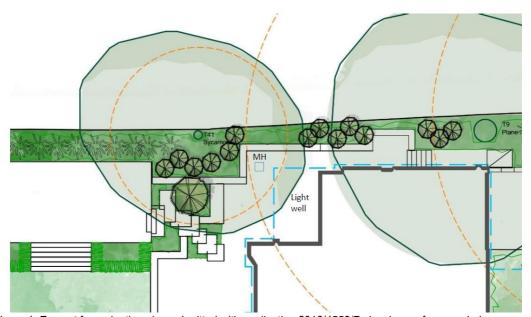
Excerpt from planting plan submitted with application 2016/4558/P showing surface manhole cover and lightwell which prevent shifting of retaining wall return eastwards, away from T41
